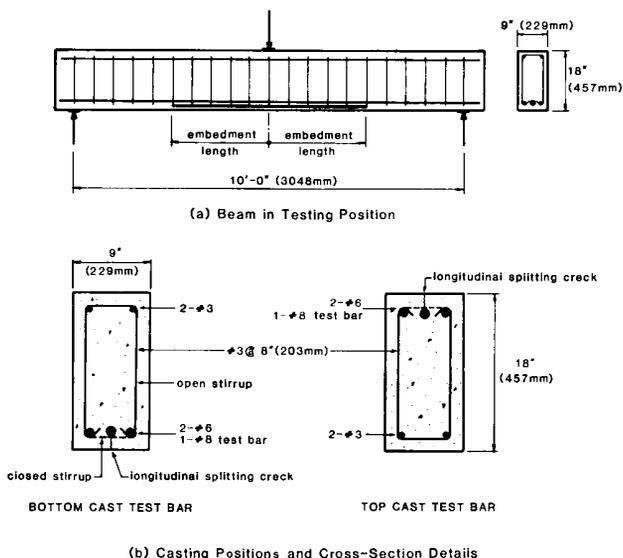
Test set-up and positions of casting (1 in. = 25.4 mm)
